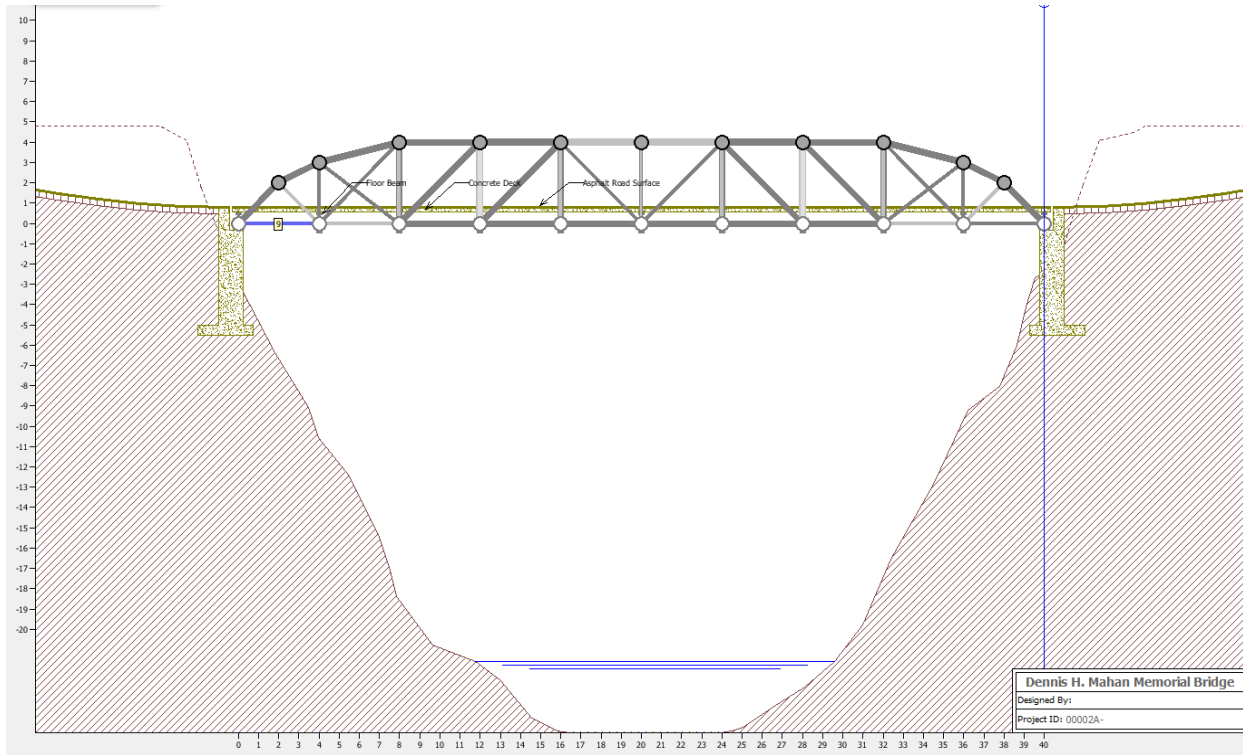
Howe Truss Bridge Model from Bridge Designer 2015
